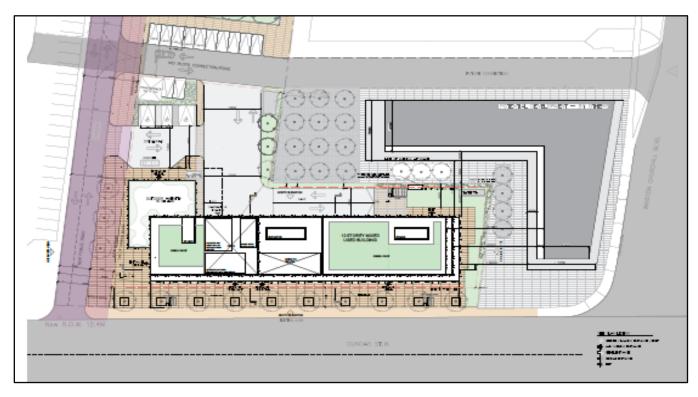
Zoomed-in Version of Conceptual Site Plan, Prepared by Hout Architects
